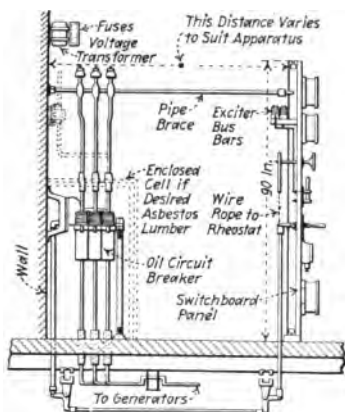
Mechanical remote-control circuit-breaker mounted on wall.
